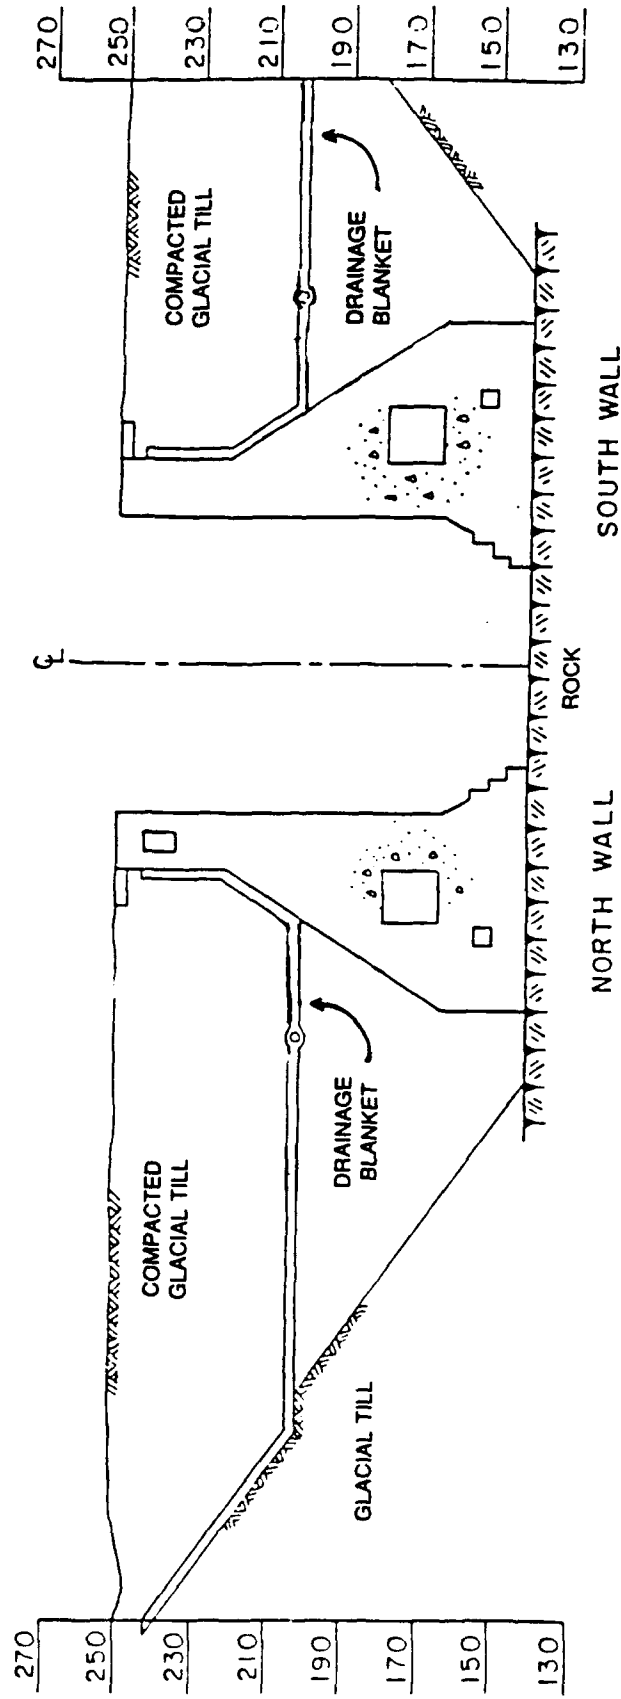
Typical cross section through the chamber at Eisenhower Lock
